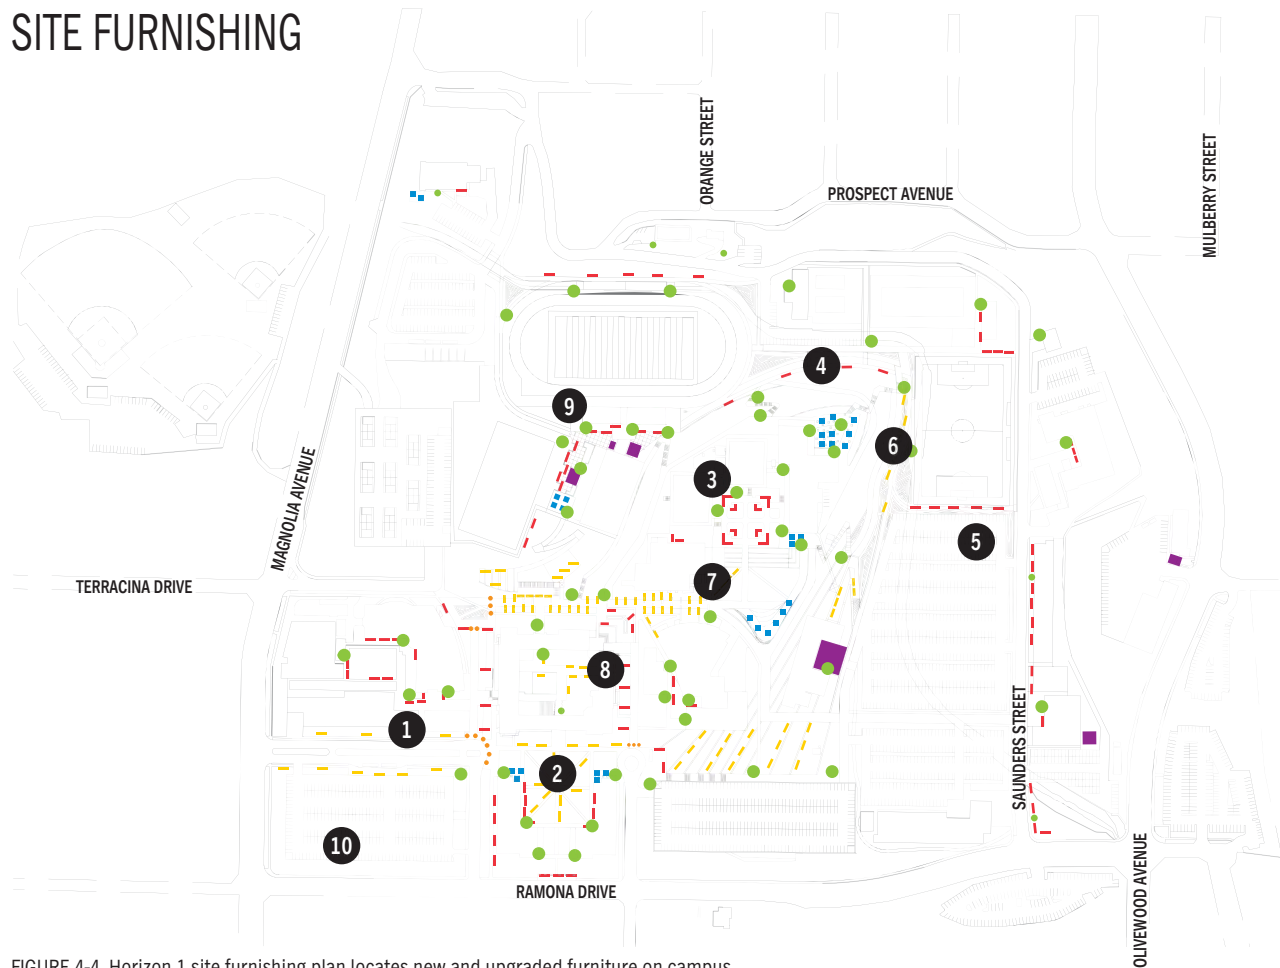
Horizon 1 site furnishing plan locates new and upgraded furniture on campus
